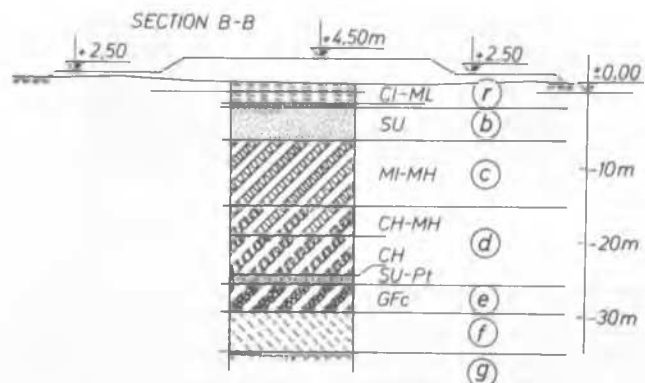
Cross-section B-B of the preload embankment and geo-technical soil profile
